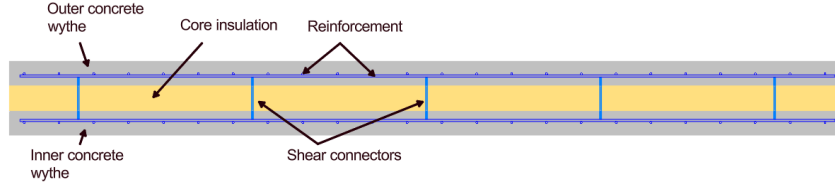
Representation of a Prefabricated Concrete Sandwich Panel.
